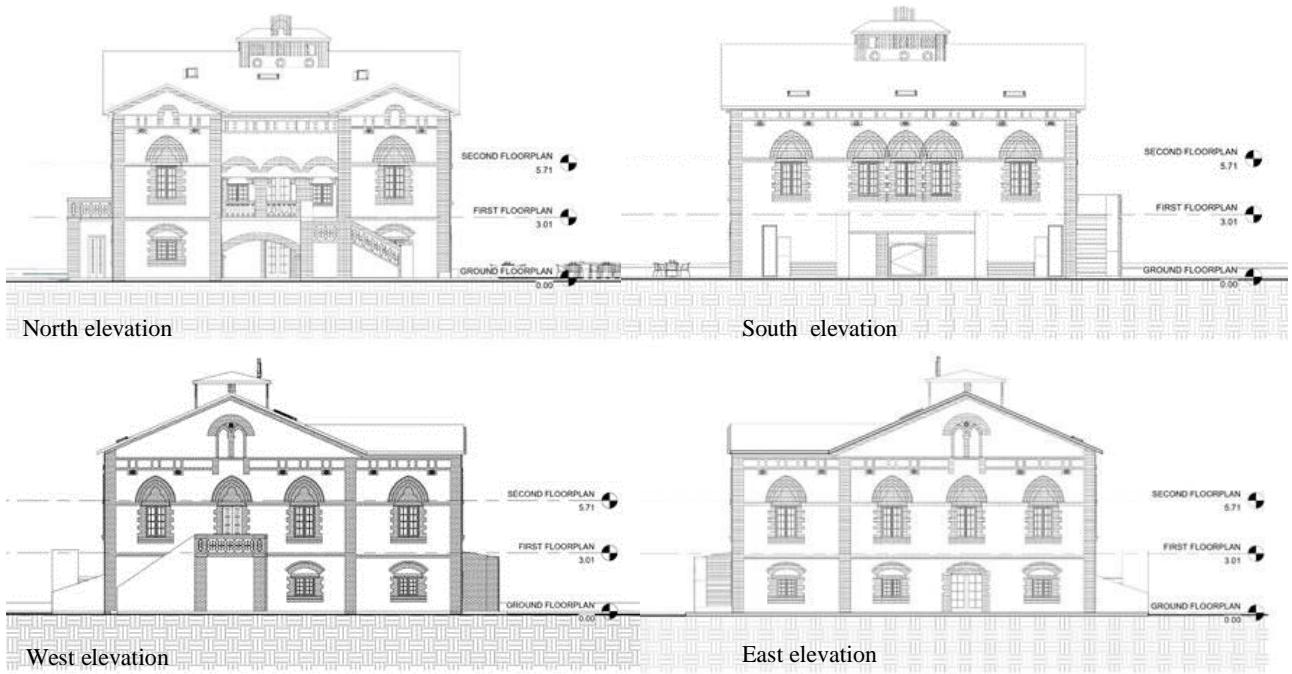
Images showing the proposed (NORTH, SOUTH, WEST, EAST) elevation plans
